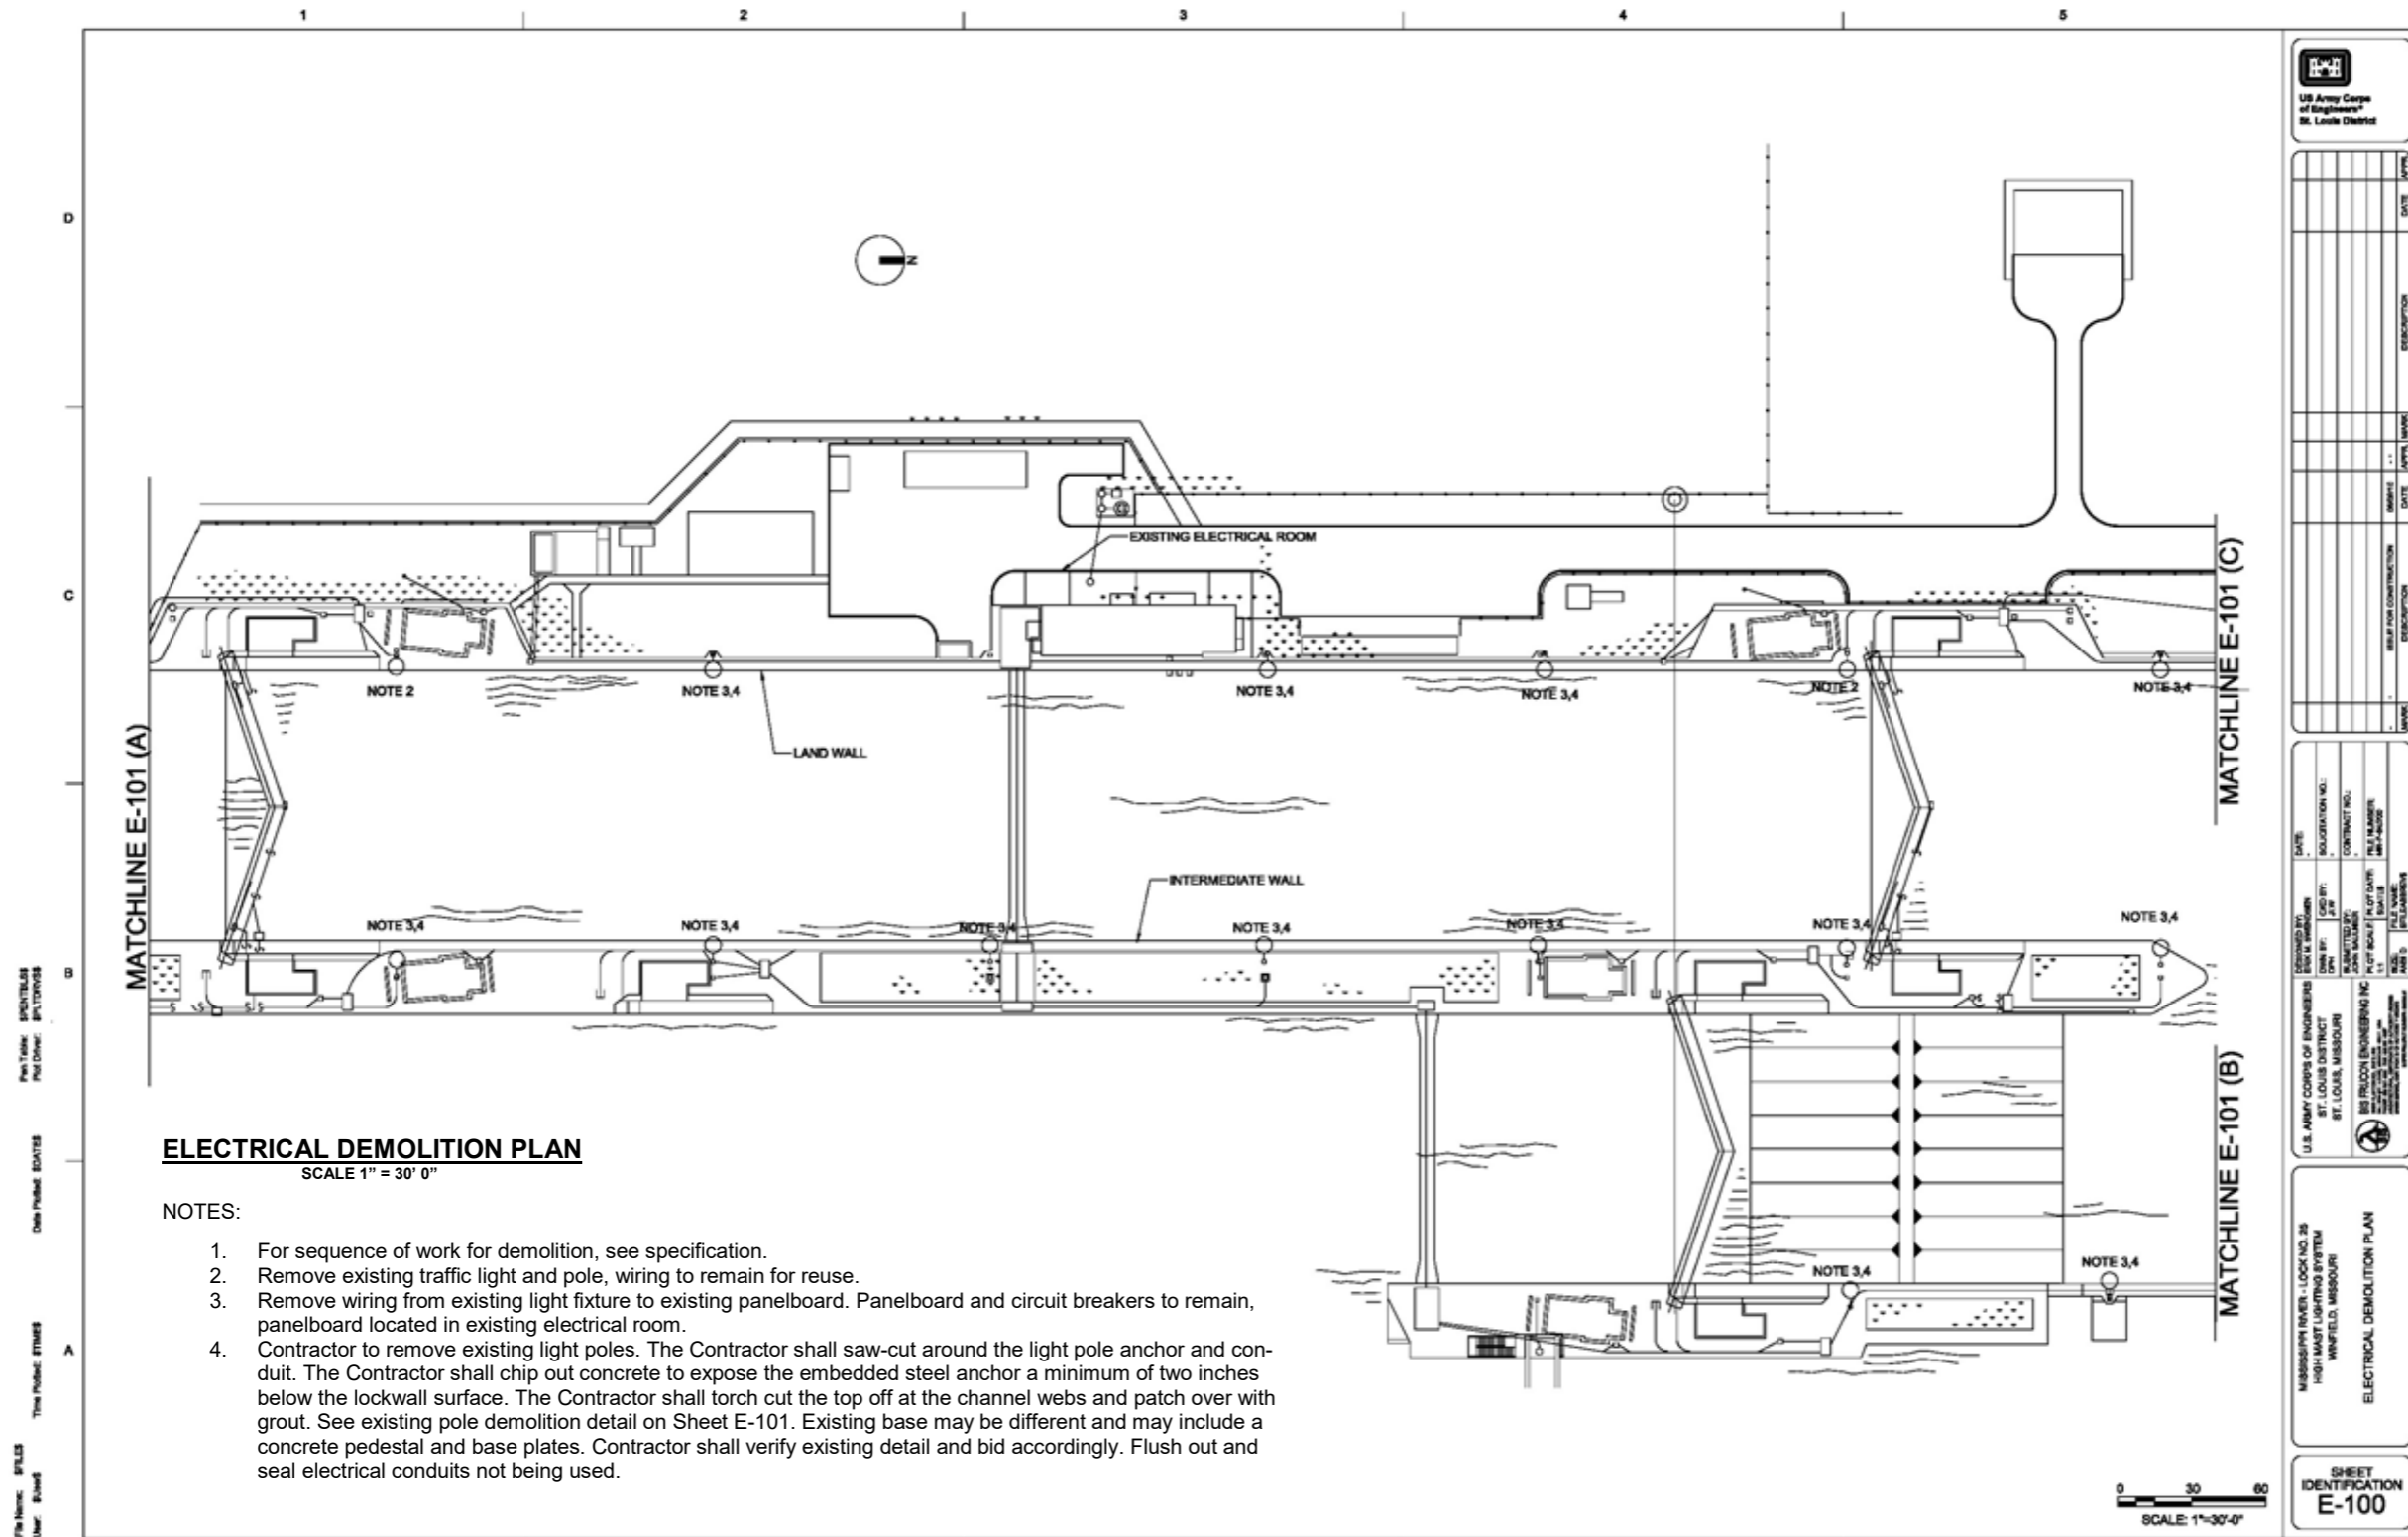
L&D No. 25, existing light pole layout, Sheet 1.
